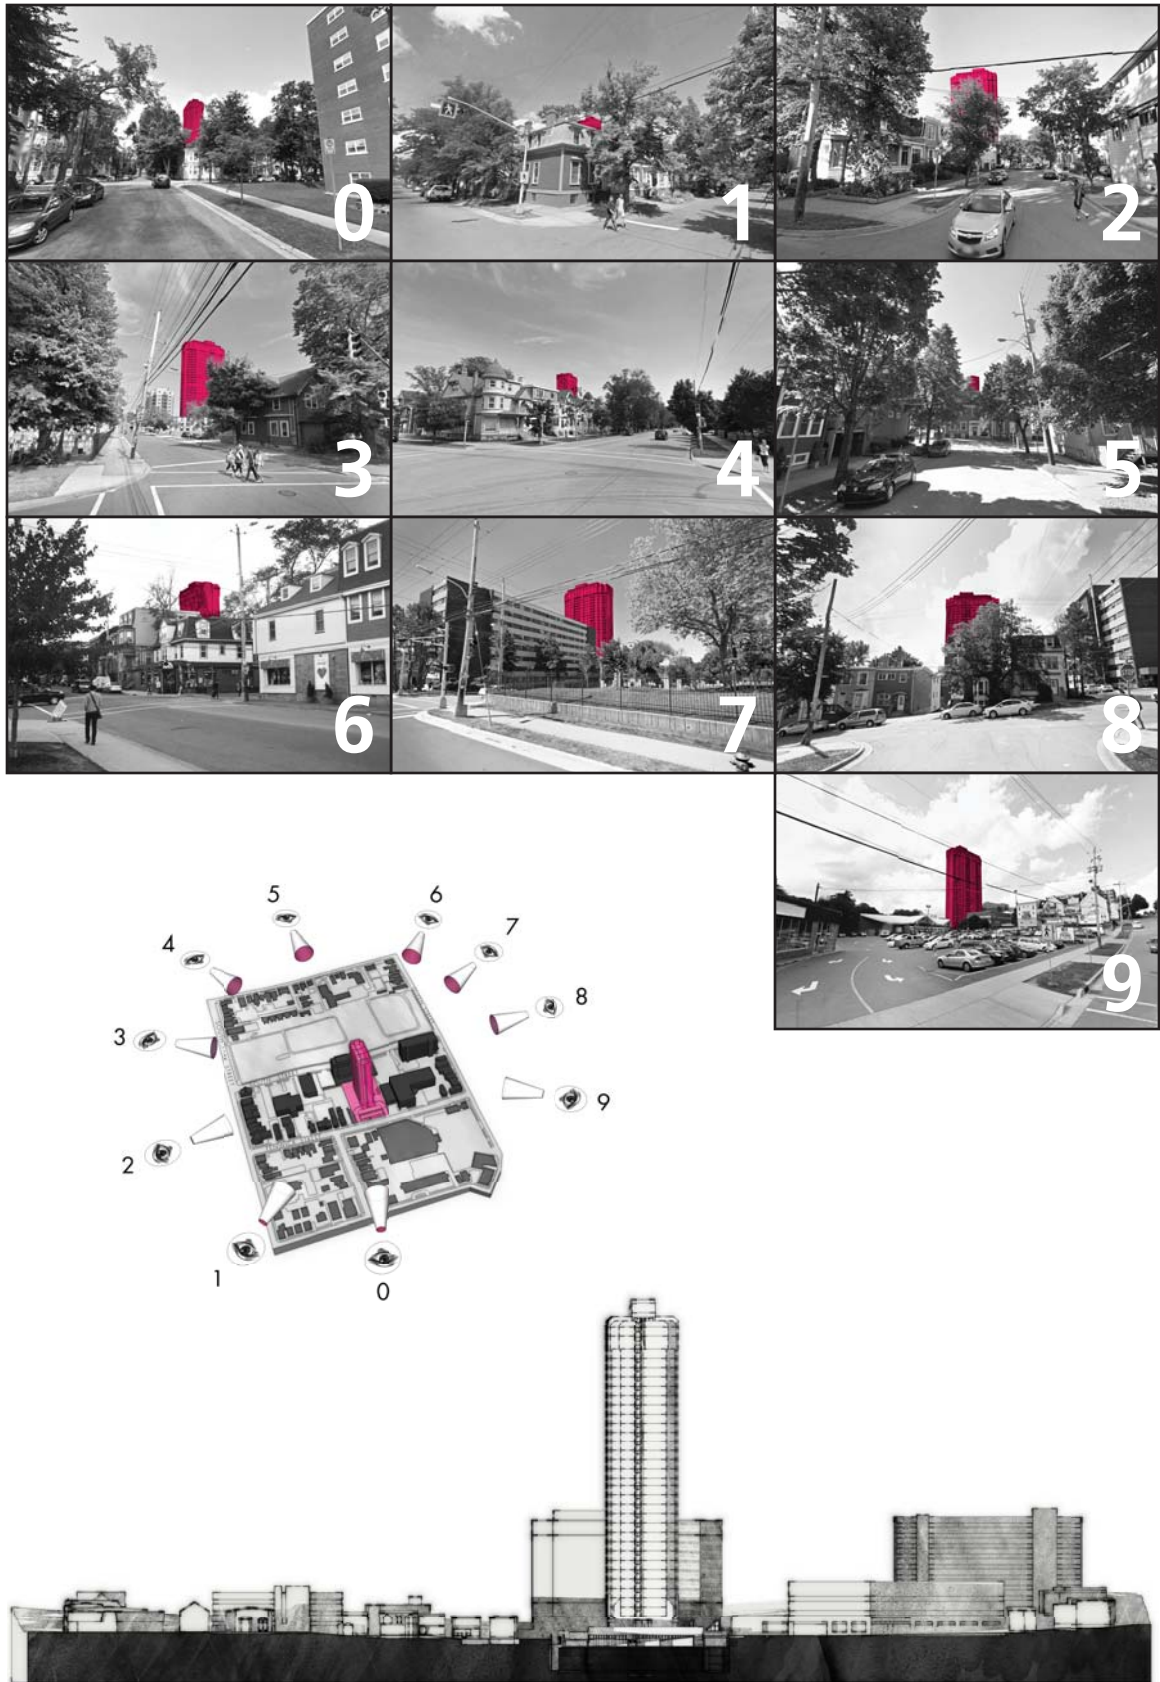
Fenwick Street elevation and photographic survey showing visual influence of the Fenwick Tower on surrounding neighbourhood.
